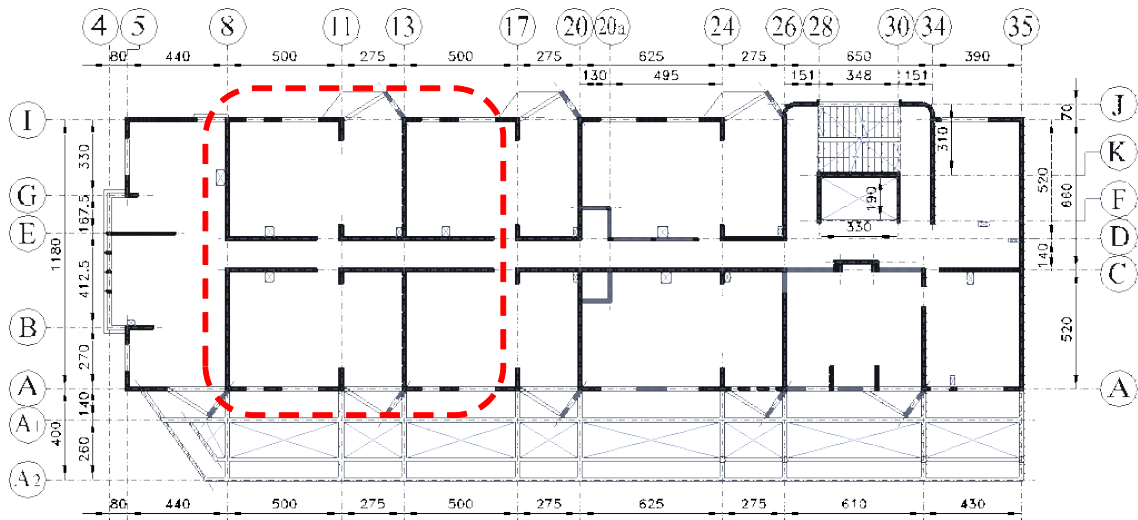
Alto Rio building second-floor plan. Dashed line encloses portion of building modeled in the nonlinear static analysis (Unit: cm) (Note: 1 cm = 0.3937 in)
